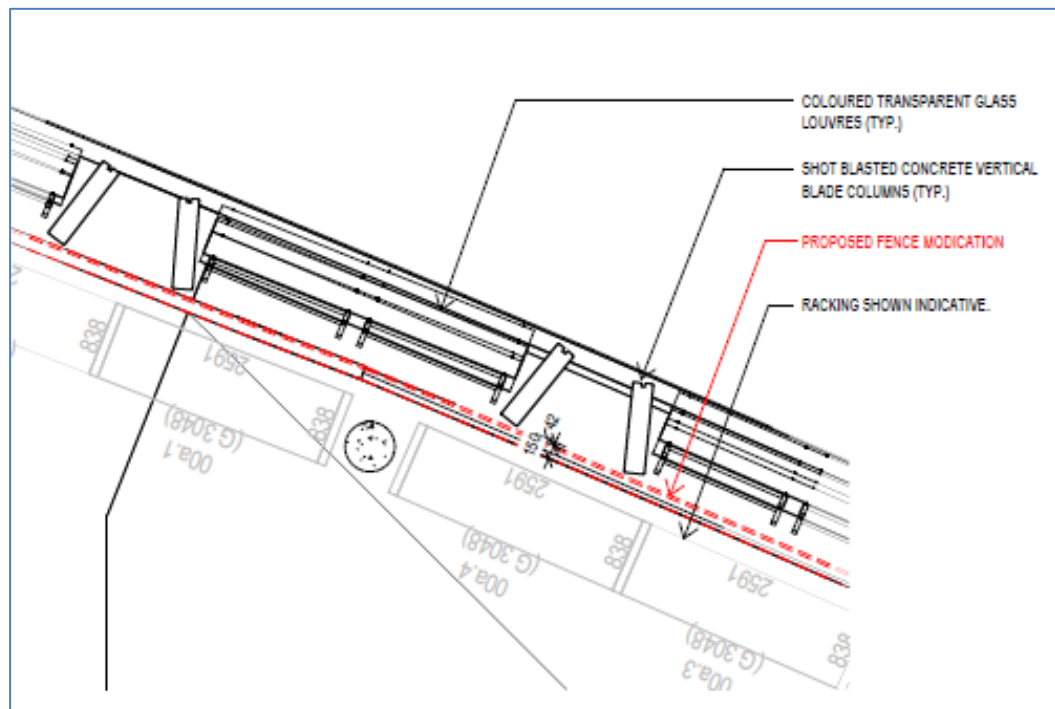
extract from proposed section plan showing mesh fencing and racking in the bagged goods area
